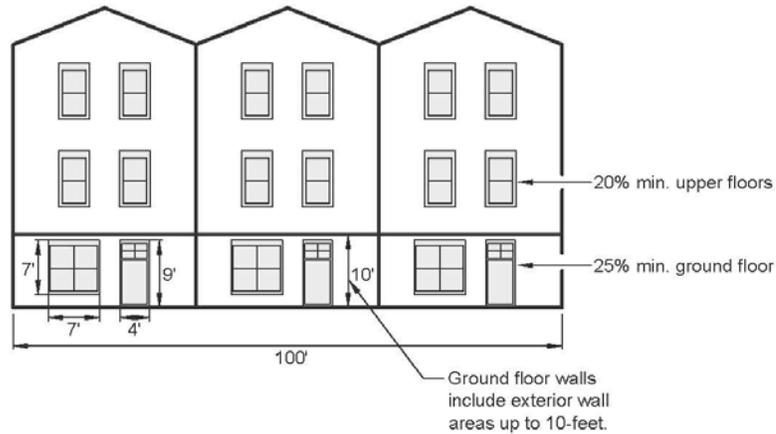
G-1: Window Coverage for Mixed-Use Buildings
